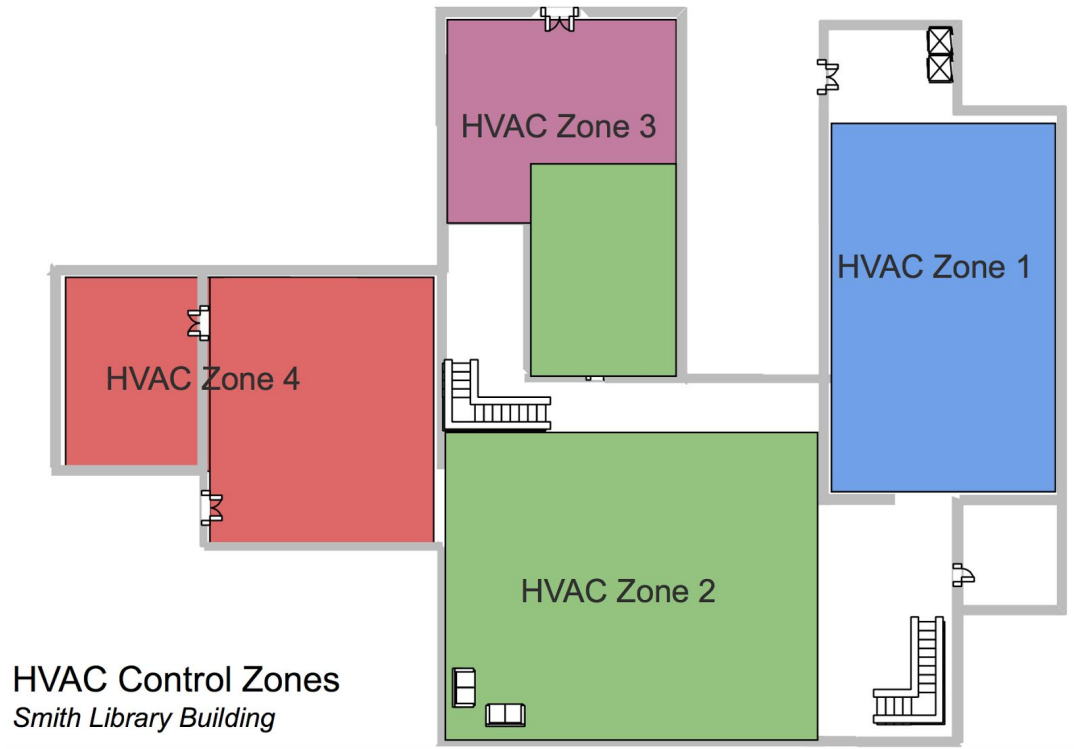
Typical Building Plan with HVAC Zones Highlighted
